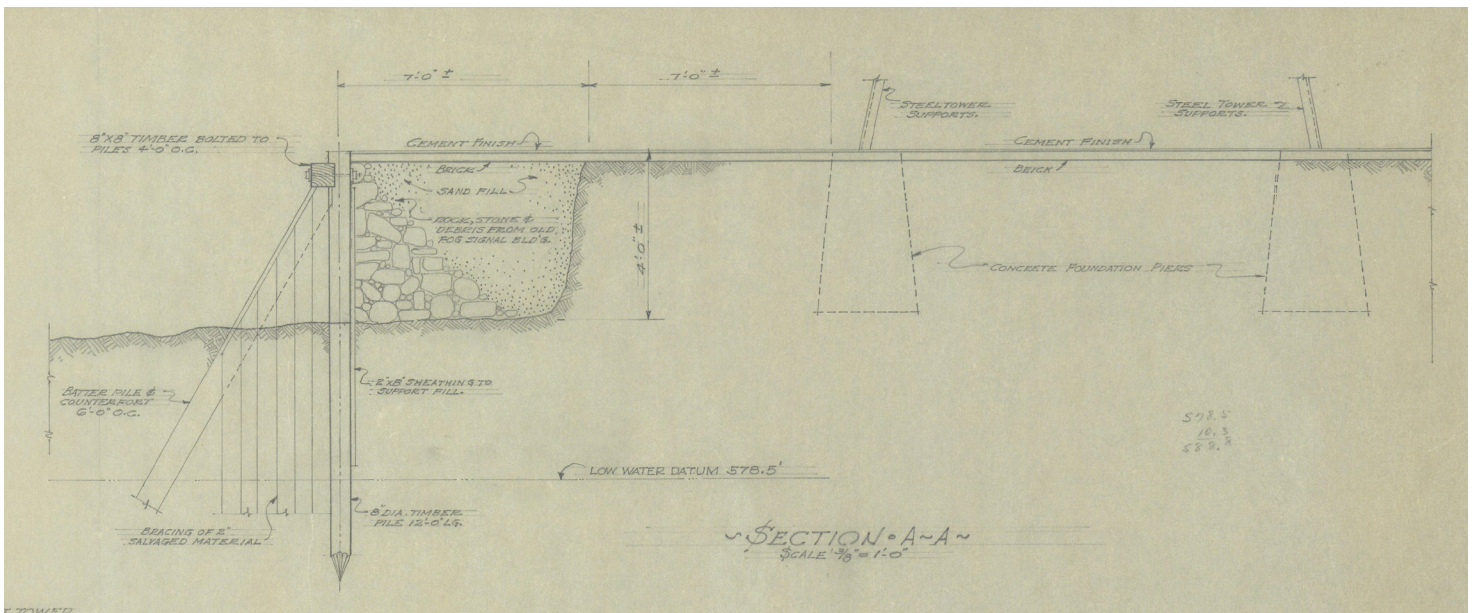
B-56: Drawing for temporary timber shore protection to be constructed around the new fog signal tower.
